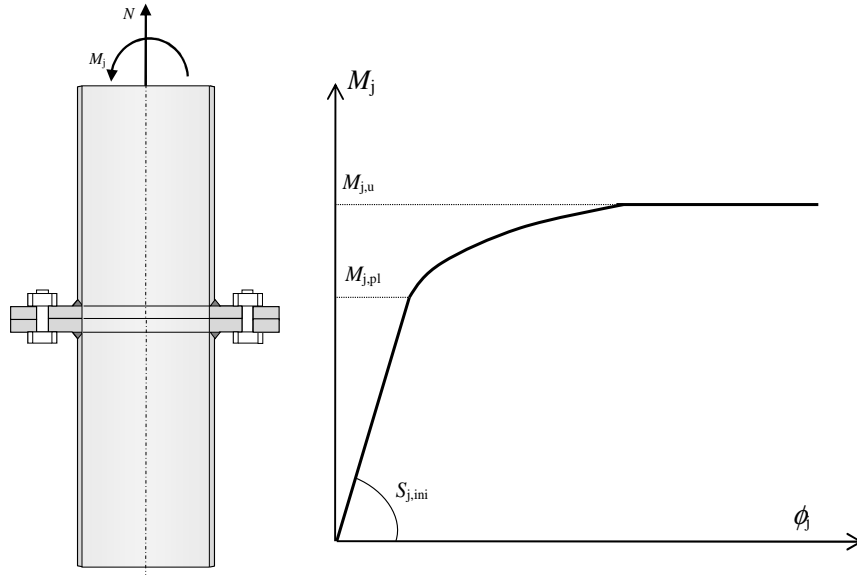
Bolted circular flange joint subjected to a bending moment and an axial force
